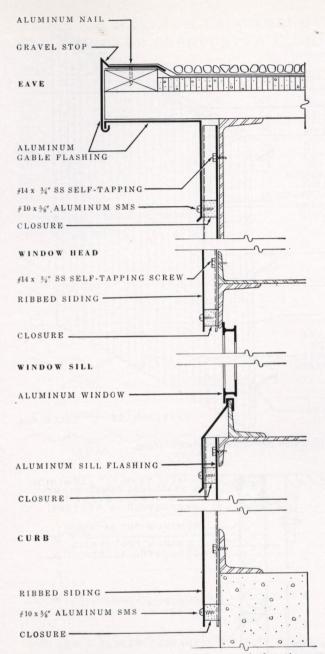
Ribbed siding installation, vertical section. deck boards.
